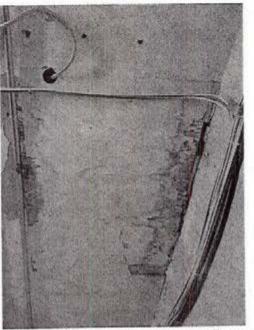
Water damage to ceiling in Basement Room 012.
